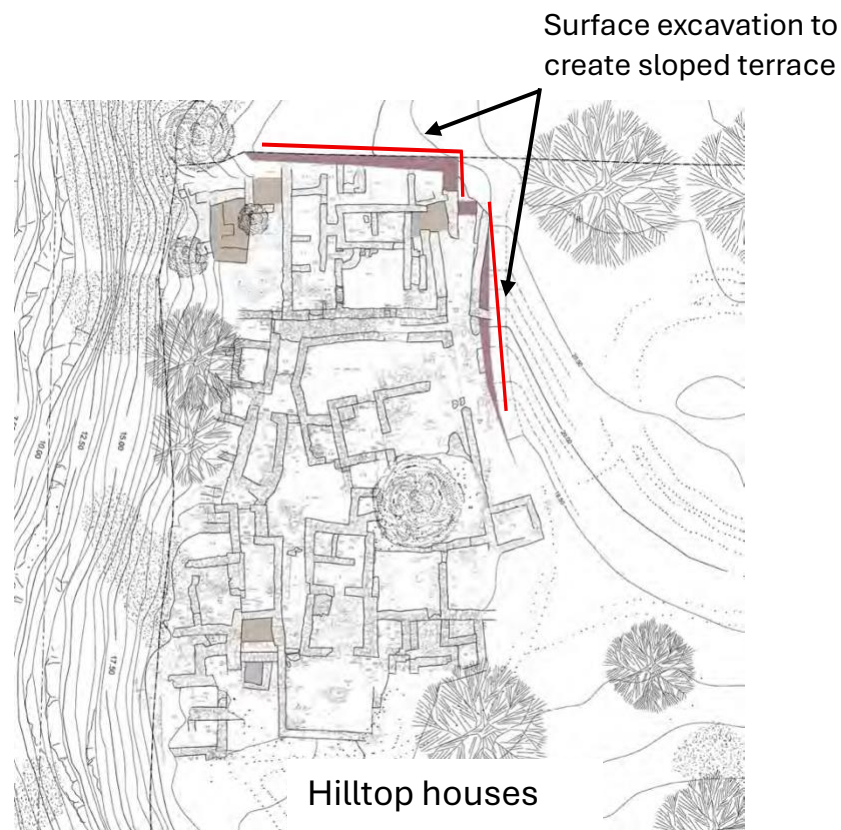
Showing trench sides that require excavation for stabilization. Yellow completed
